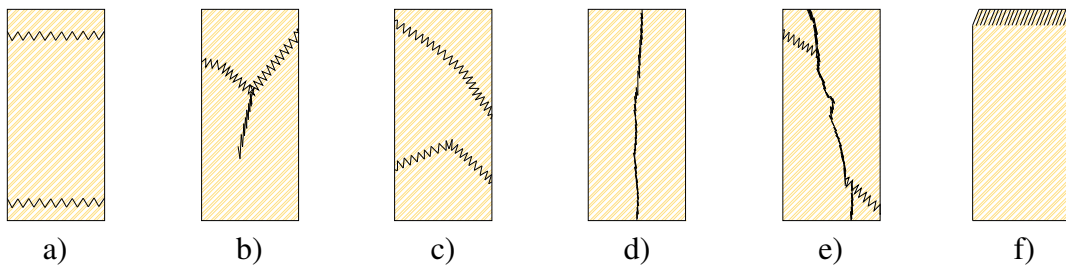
Types of compression failure modes: a) crushing; b) wedge splitting; c) shearing; d) splitting; e) crushing and splitting; f) brooming.
